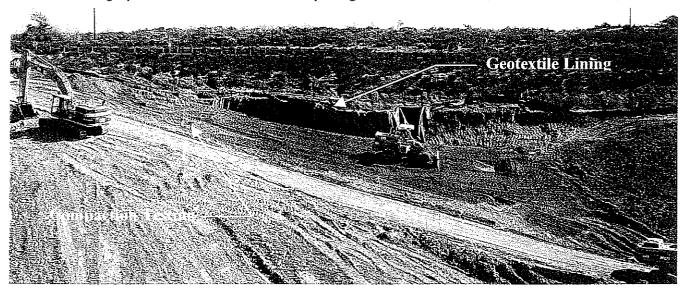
Site 1E Excavation of Q12, R10 and R12 Complete; Overexcavation Continues (November 17,1999) PC1.#3
